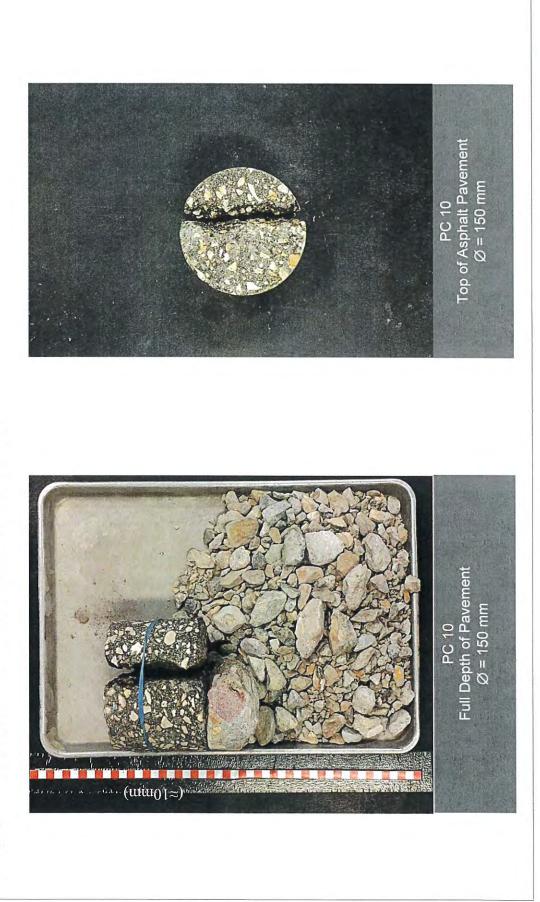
Specimen from Leila Avenue, Eastbound Curb Lane
